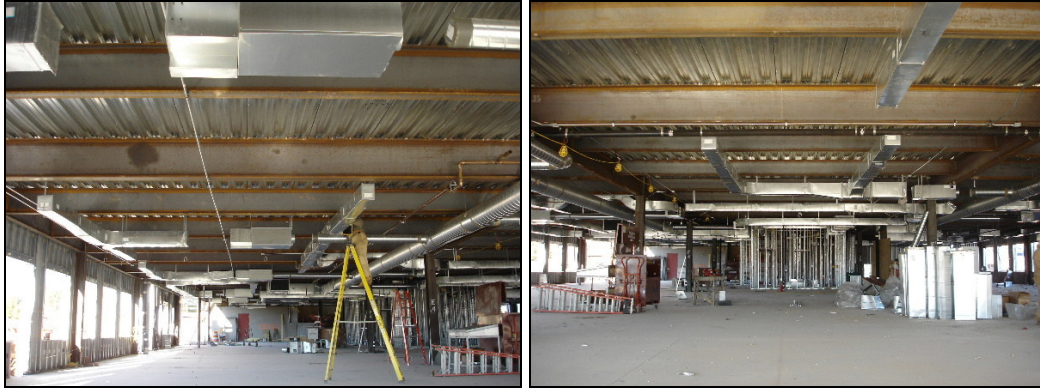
VTK2 Underside Conditions of Tested Floor
